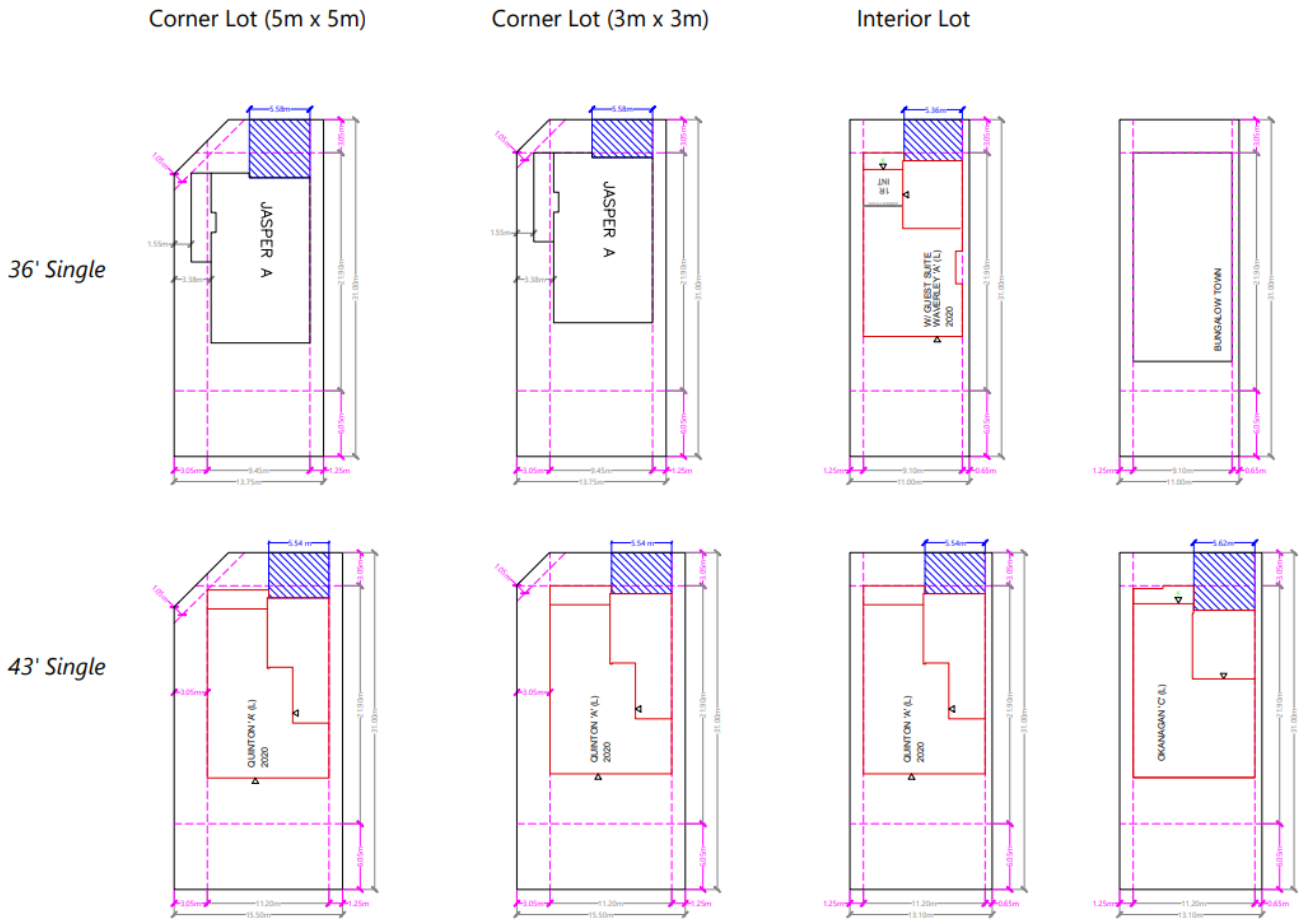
Conceptual Site Plan Layouts for 36' and 43' single-detached dwelling lot widths. House footprints, outlined in red.
